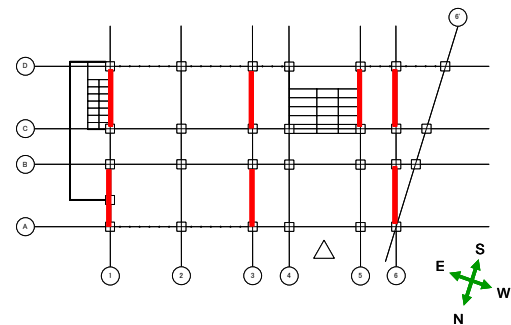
Ground Plan of Slight Damaged Building in BPKP
